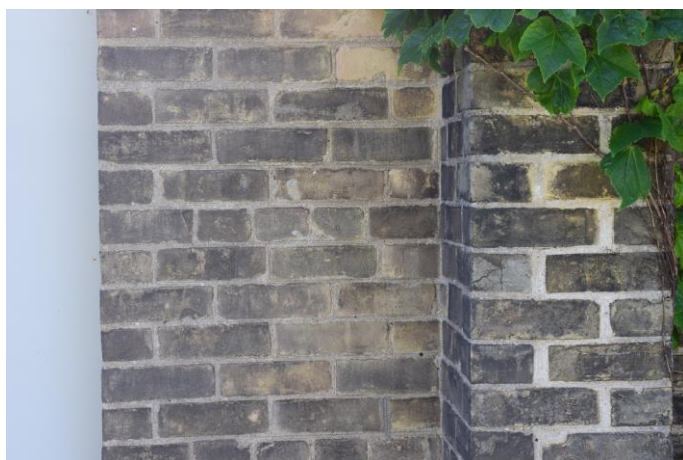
Chapel of Hope close-up of brick exterior near buttress on south elevation
